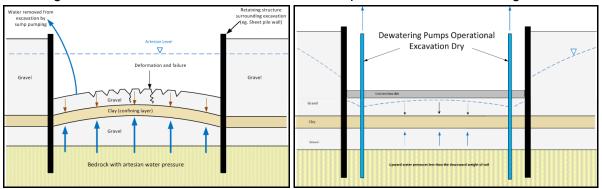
& 18. Examples of structural uplift, including cracking of a concrete slab.
